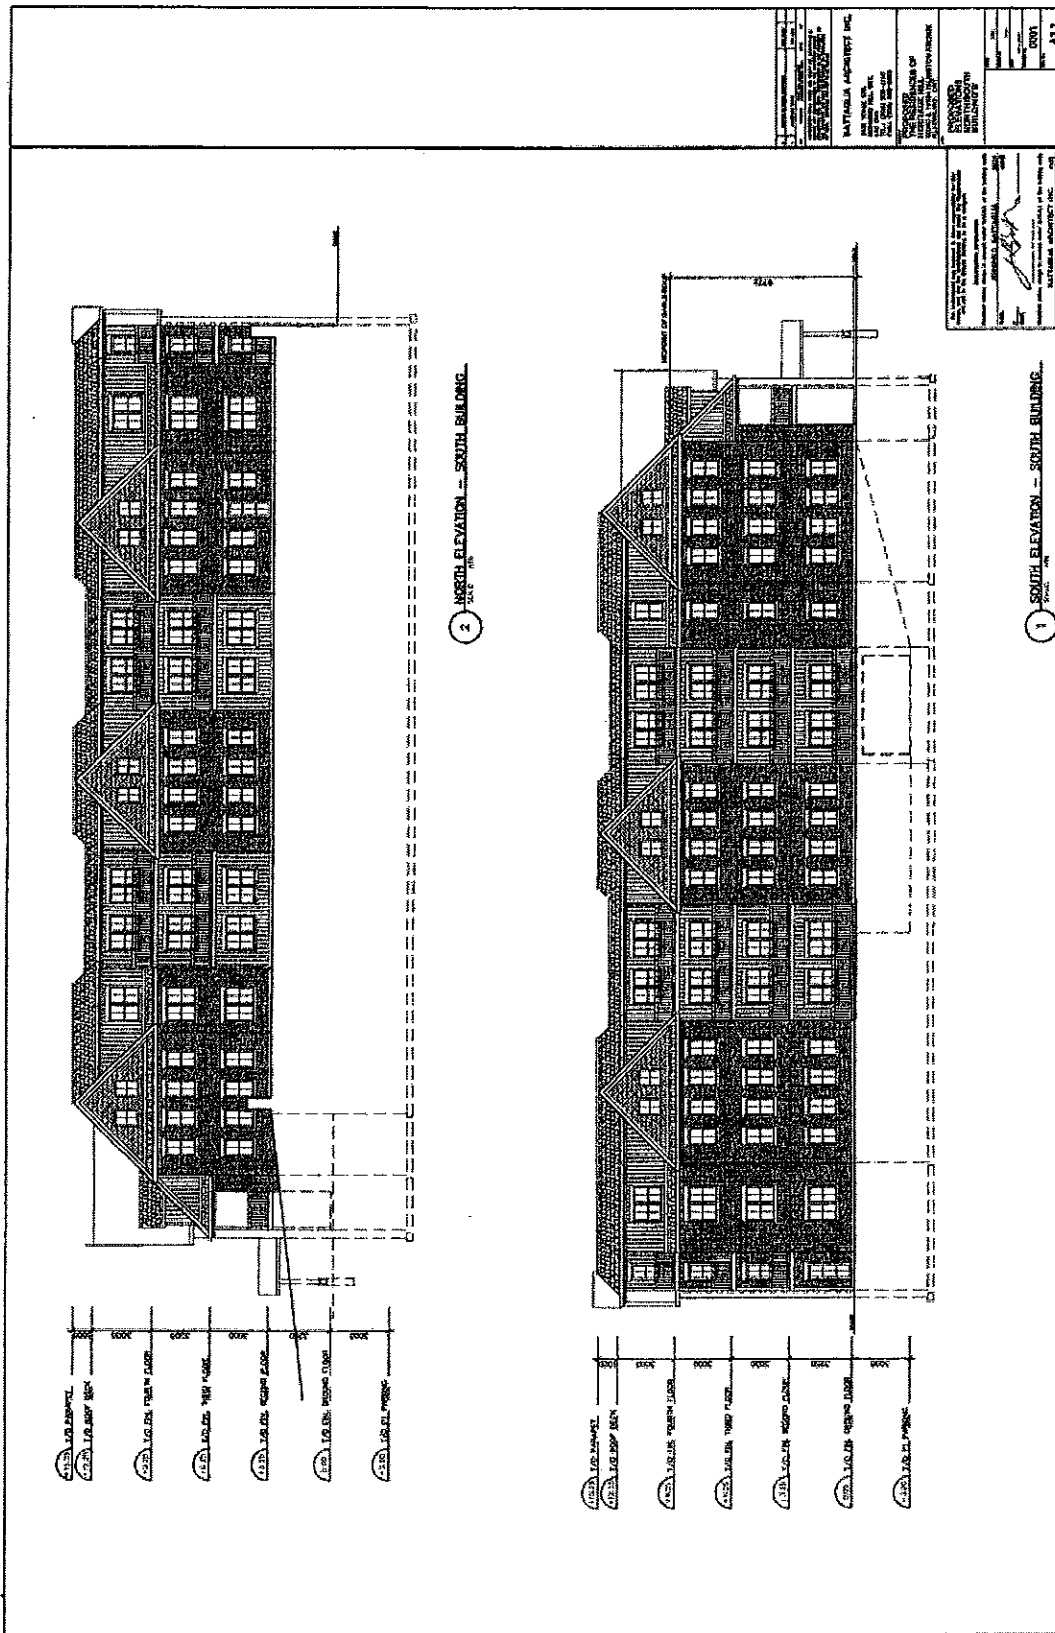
Proposed Side Elevations “Building B” (28 November 2008)
